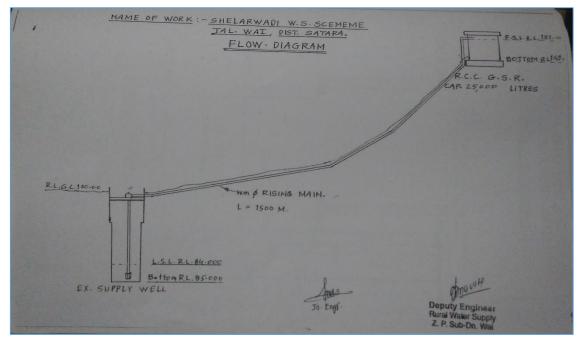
Schematic layout of the scheme (Ref.: DPR provided by ZP to KBP College of Engineering, Satara)
